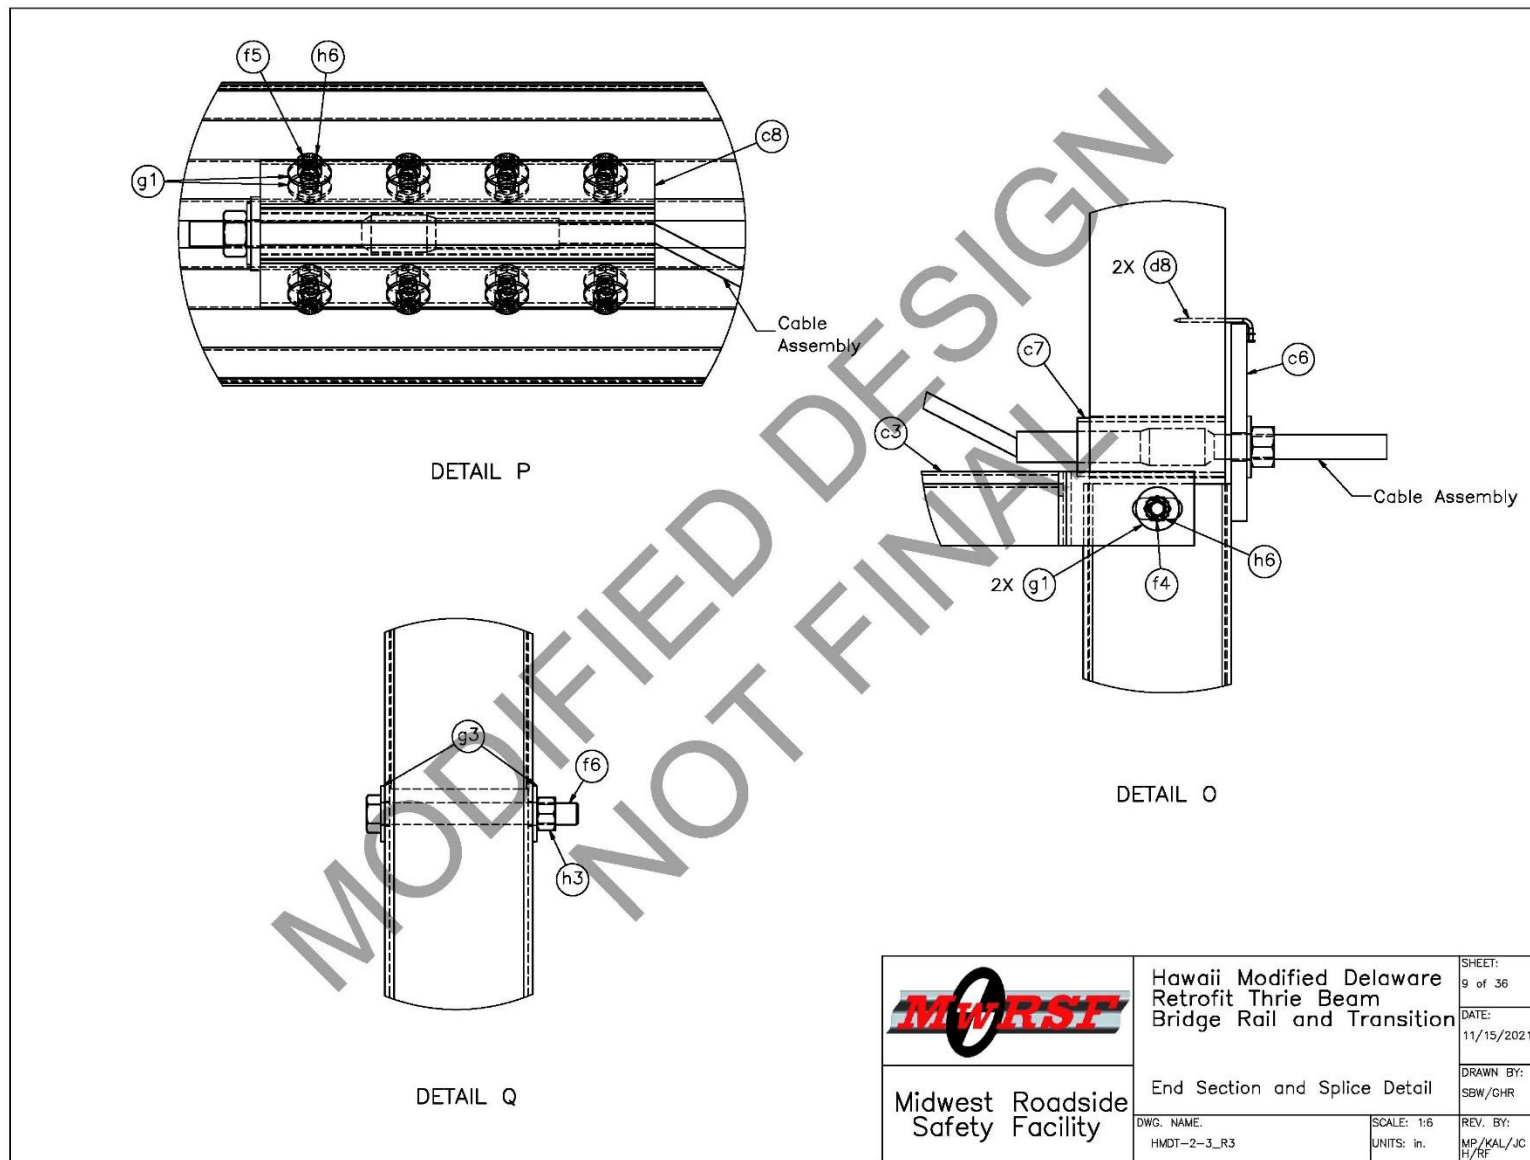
End Section and Splice Detail, Test Nos. HMDT-2 and HMDT-3
